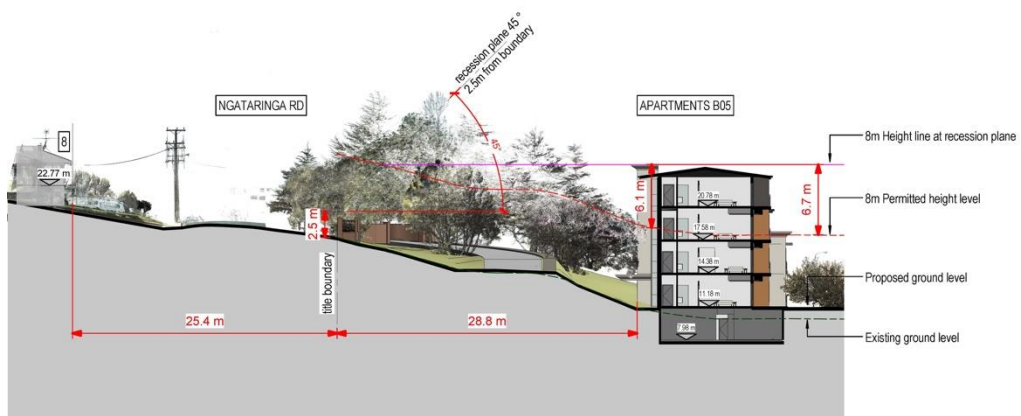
Section A through Building B05 (Ryman Drawing A3-030 RC12).
